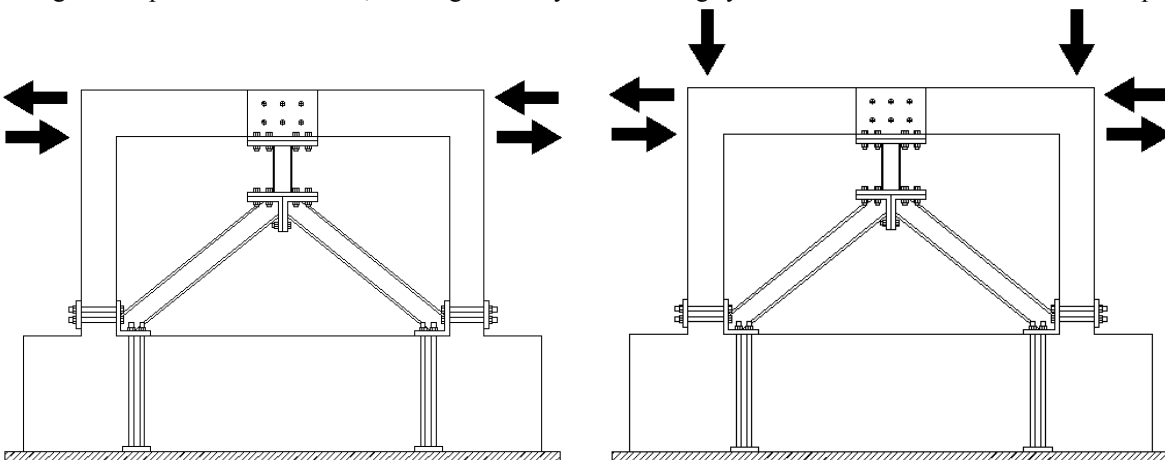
Specimens F3 and F3,N strengthened by steel bracing system and a steel link element at the top.
